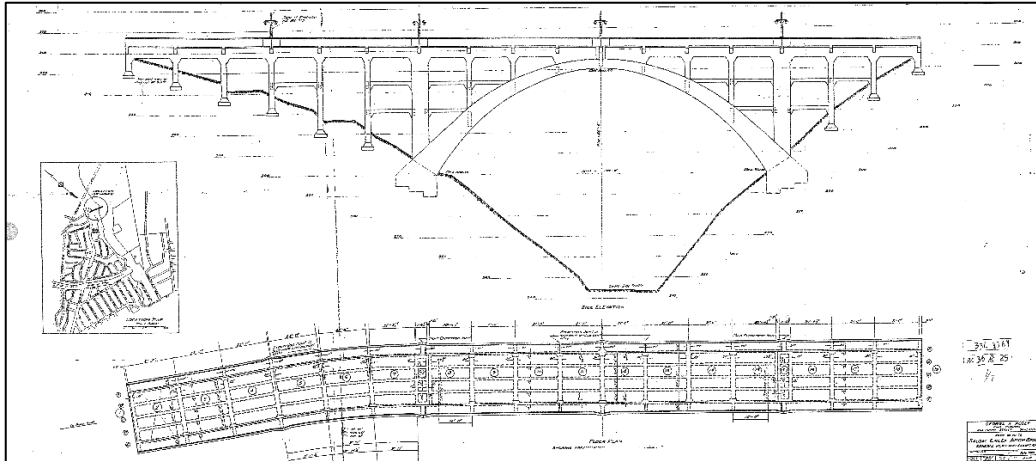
As-built drawings from for Bridge Number 33C0215/Leimert Boulevard Bridge. Source: Oakland City Archives.
